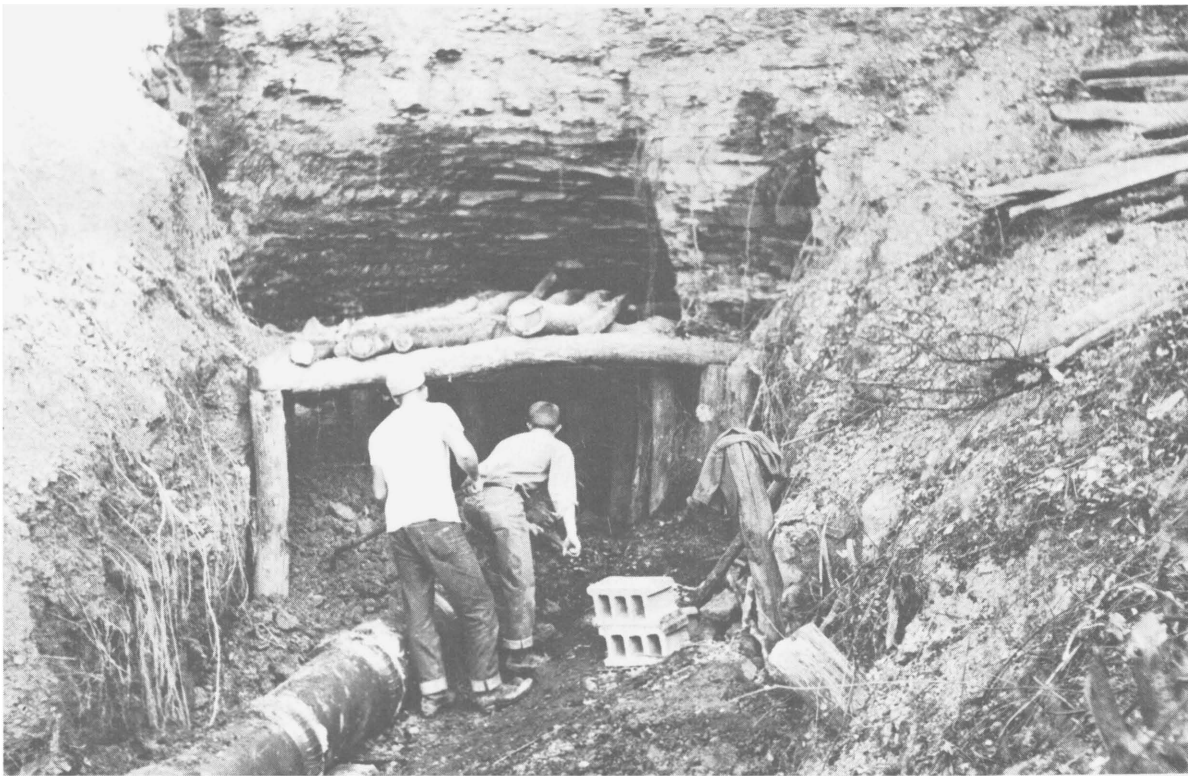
Installing Drain Traps at Two Abandoned Drift Openings.
